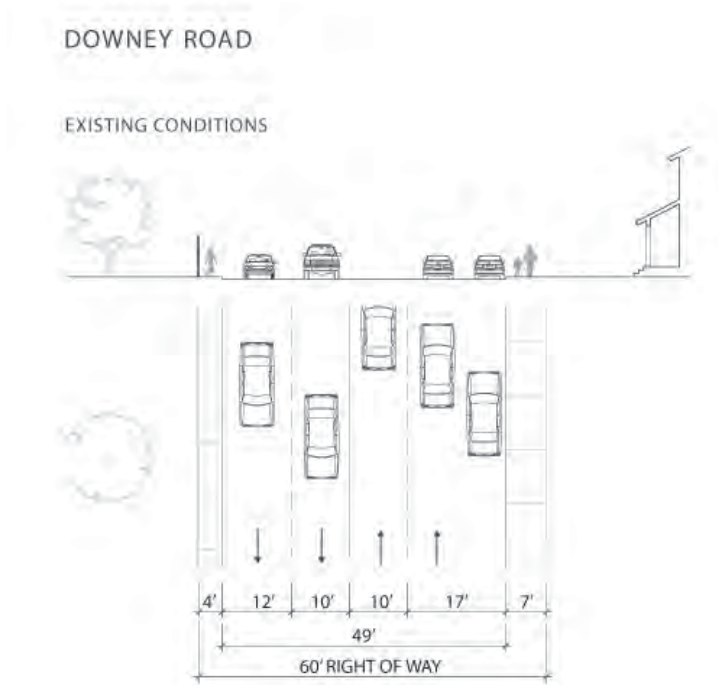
C - ILLUSTRATIVE CONCEPT DESIGN- DOWNEY ROAD LOOKING SOUTH
